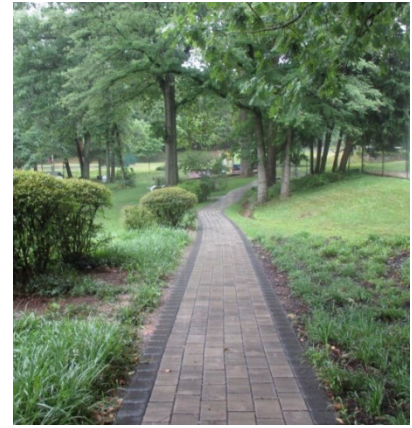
Pavement was removed and replaced with 725 square feet of interlocking permeable pavers at a commercial property.
